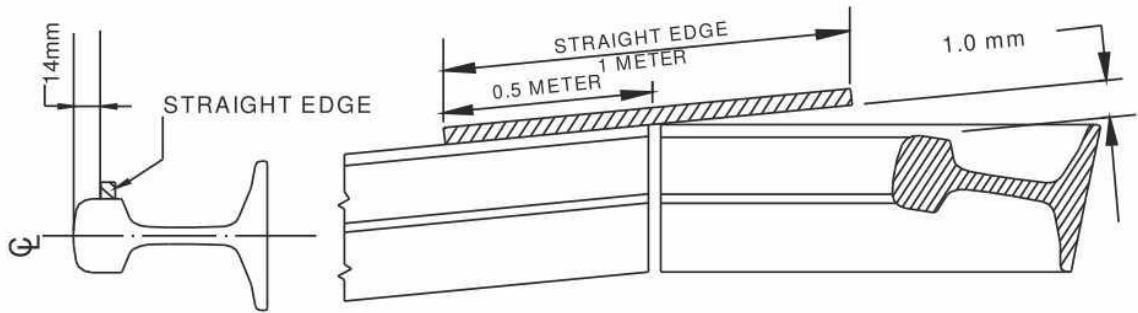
(a) Tolerance for Lateral Misalignment at the Time of Welding
